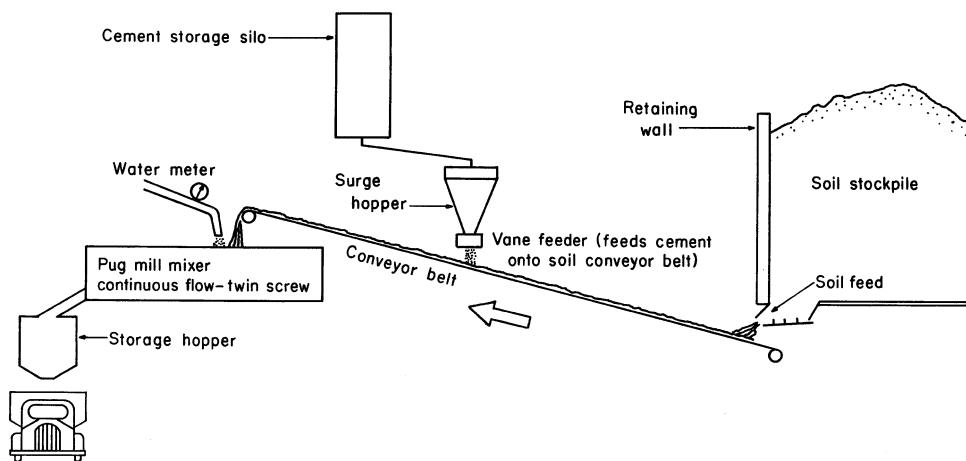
Diagram of continuous-flow central plan for mixing soil cement.
